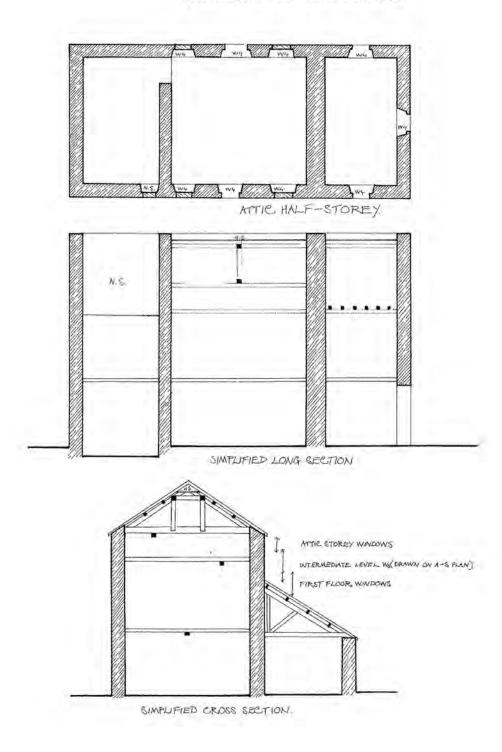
1986 survey, Building 2 sections and attic plan (Higgins 1986).
